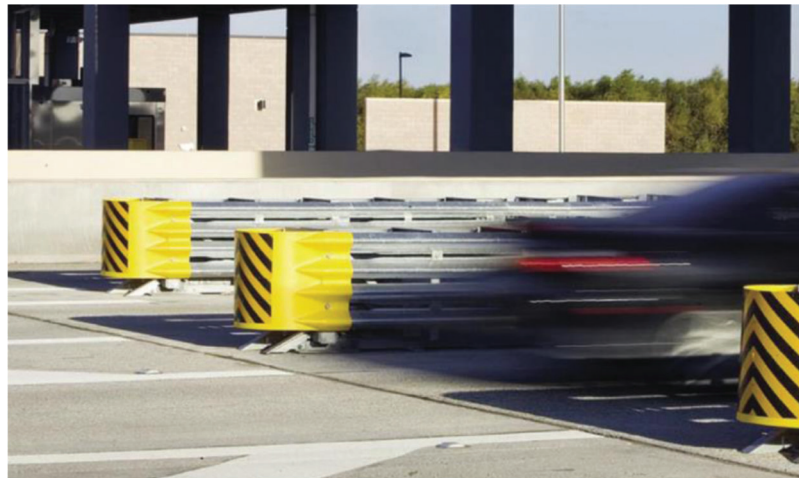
SENTRE guardrail end treatment (drawing by Arizona DOT).
